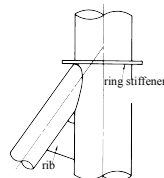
Reinforcement at the Column to Bracing Joint (Steel pipe)
